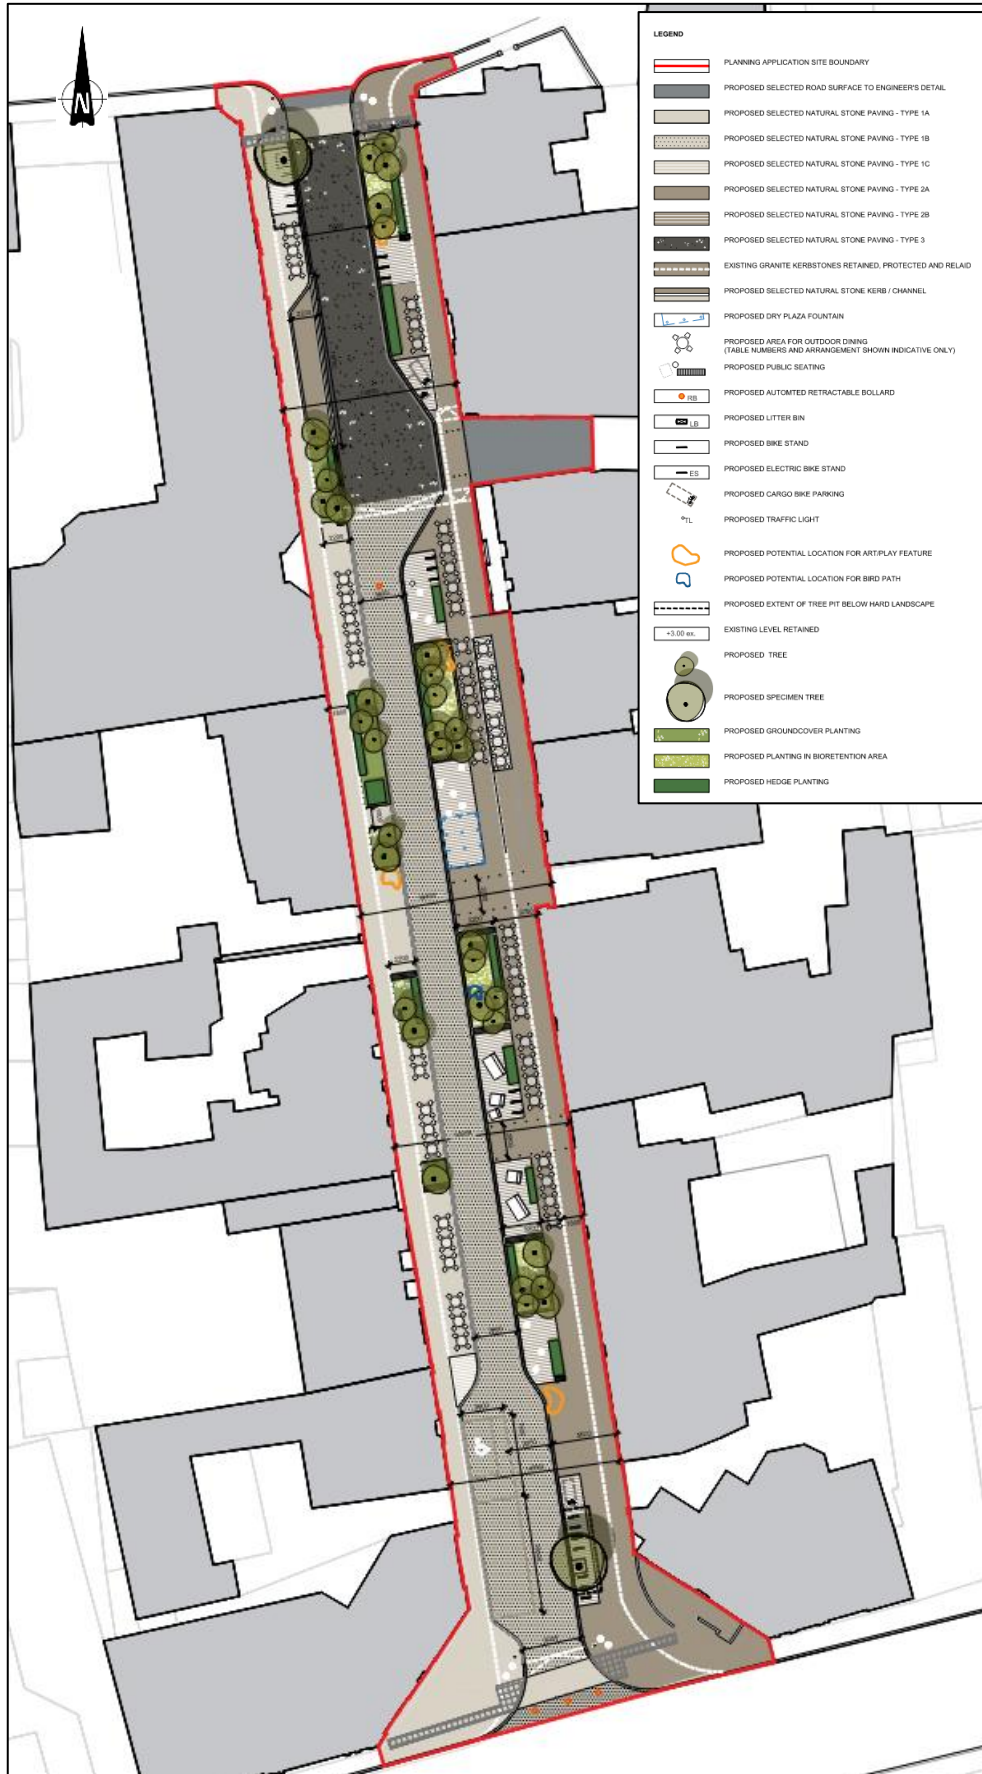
Proposed Site Layout (refer architectural documentation by Dermot Foley Landscape Architects).
